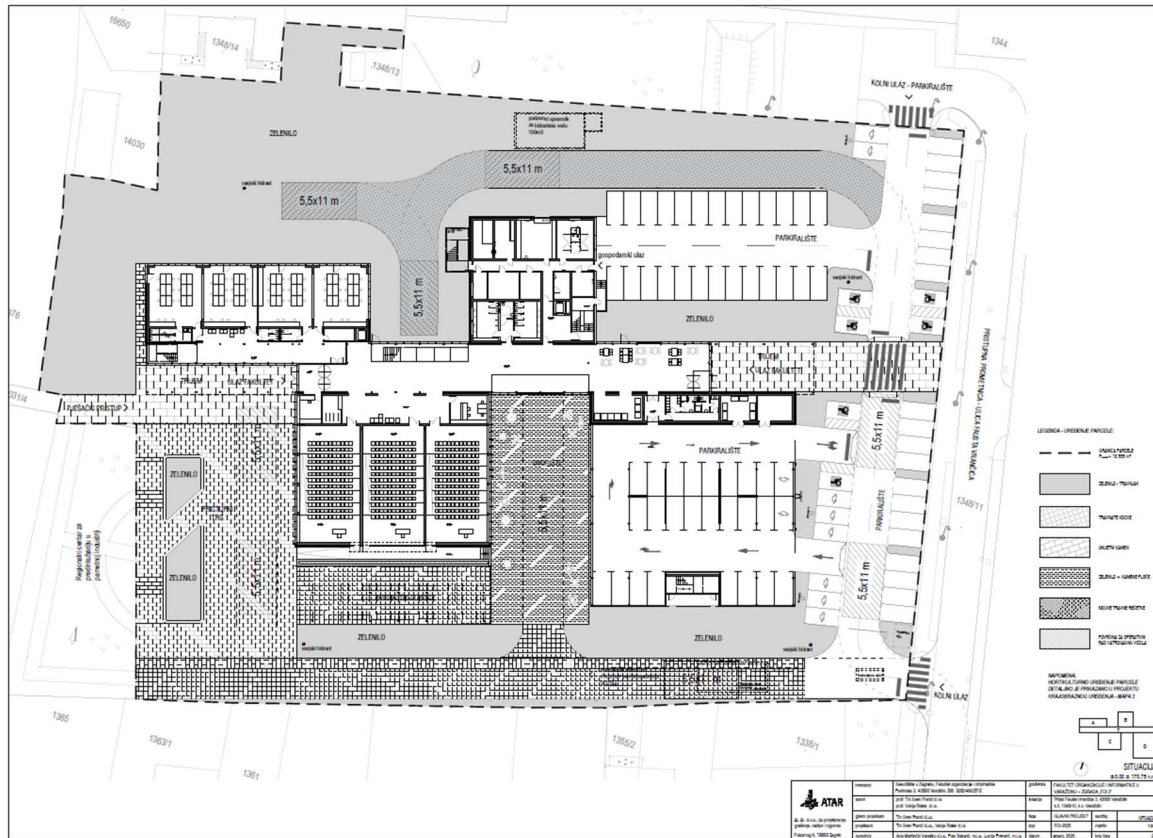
Ground Floor Plan of the FOI 2 Building, Main Architectural Design, July 2025
